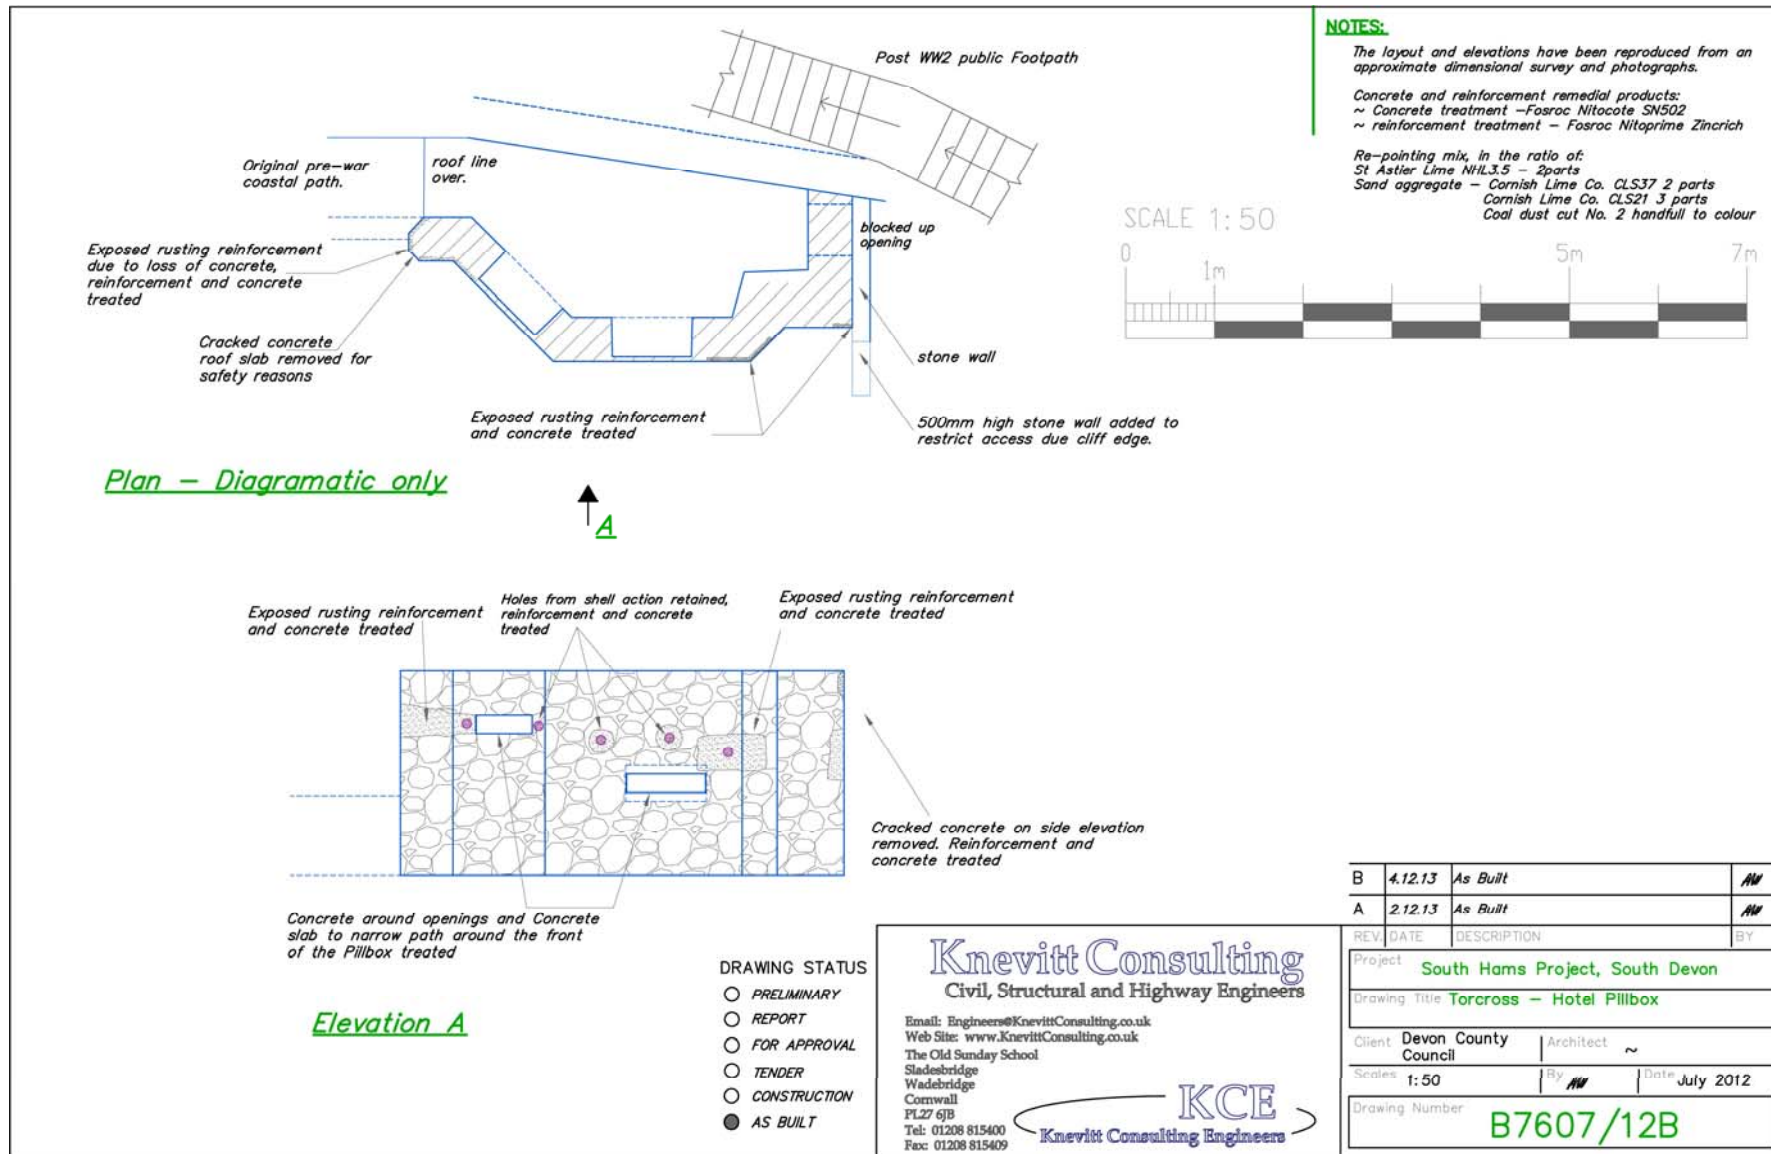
Survey plan and elevation of the Hotel pillbox after works © Kneivitts 4/12/13.
